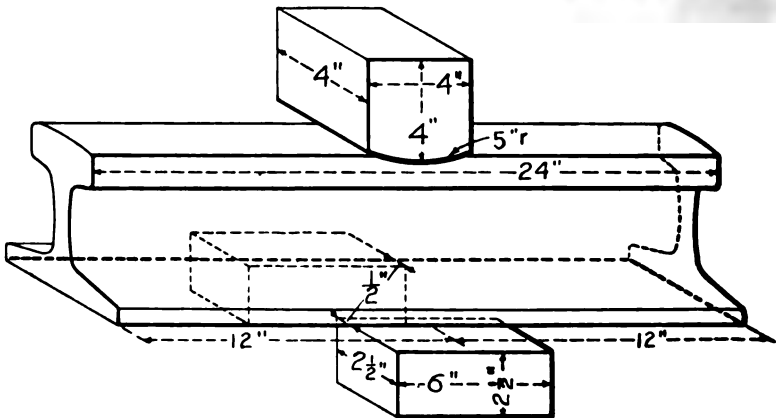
METHOD OF MAKING TRANSVERSE TEST OF THE BASE.
